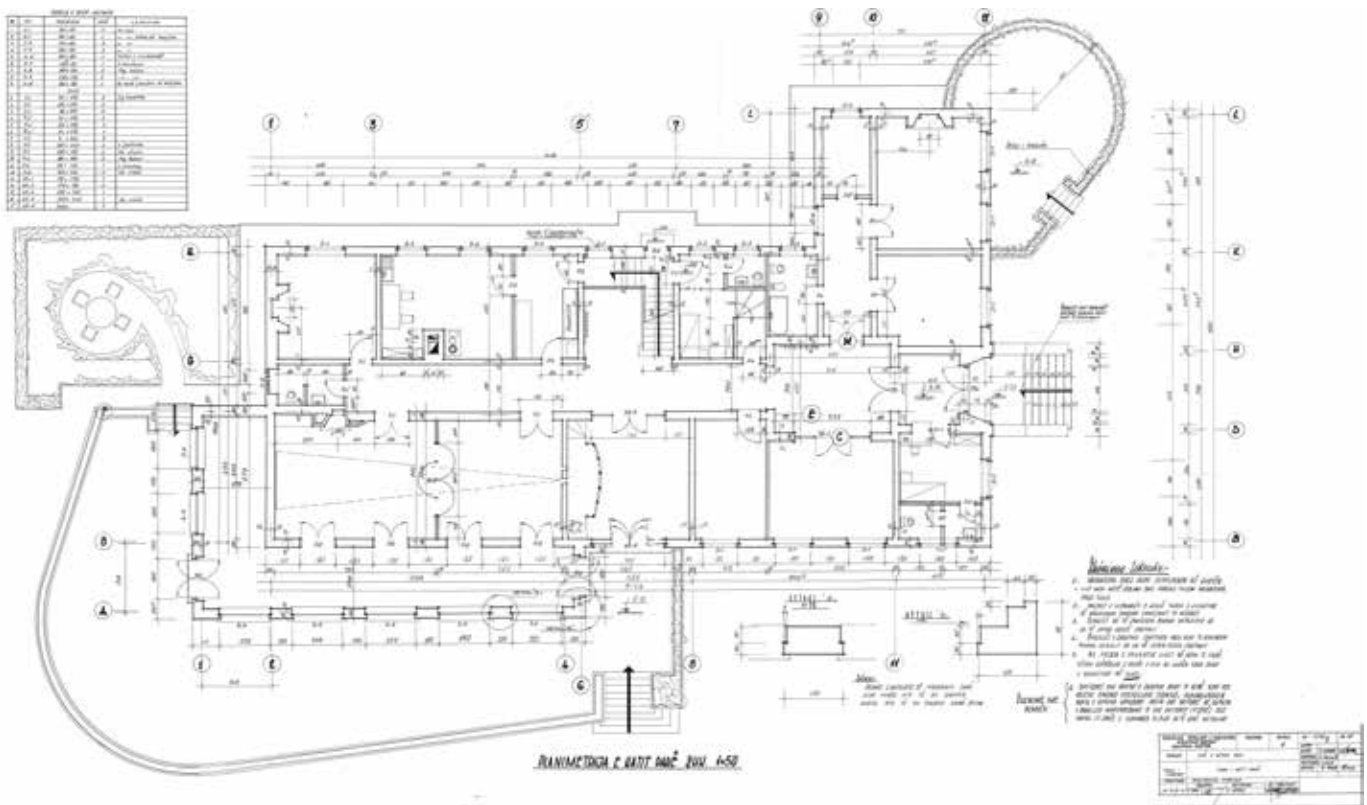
Skënder Luarasi, Villa in Dajt, 1961, construction documents, floor plan (TCAC)
